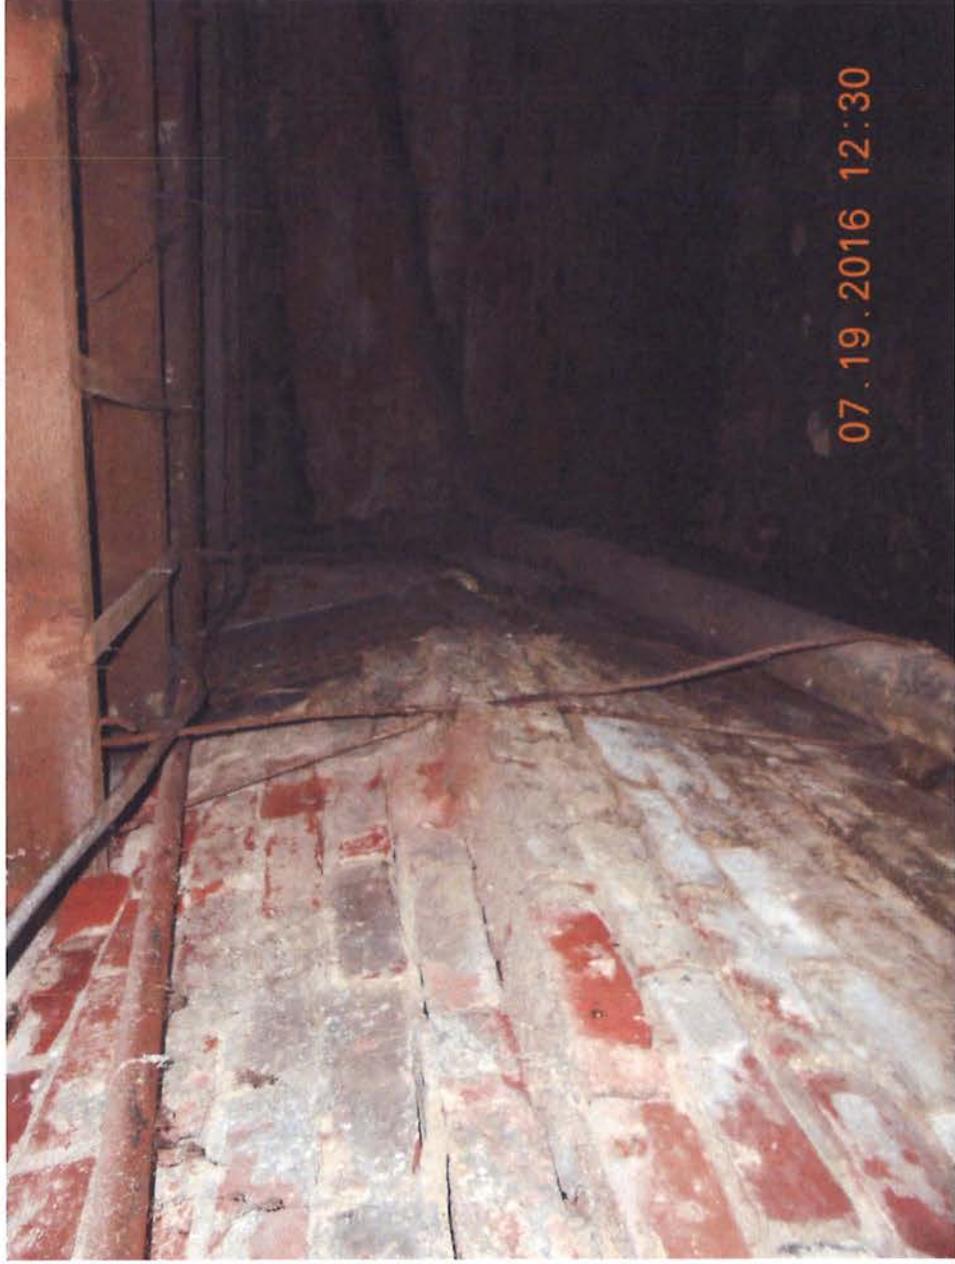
shows more deformation of the masonry wall and loose unsupported electrical conductors.
